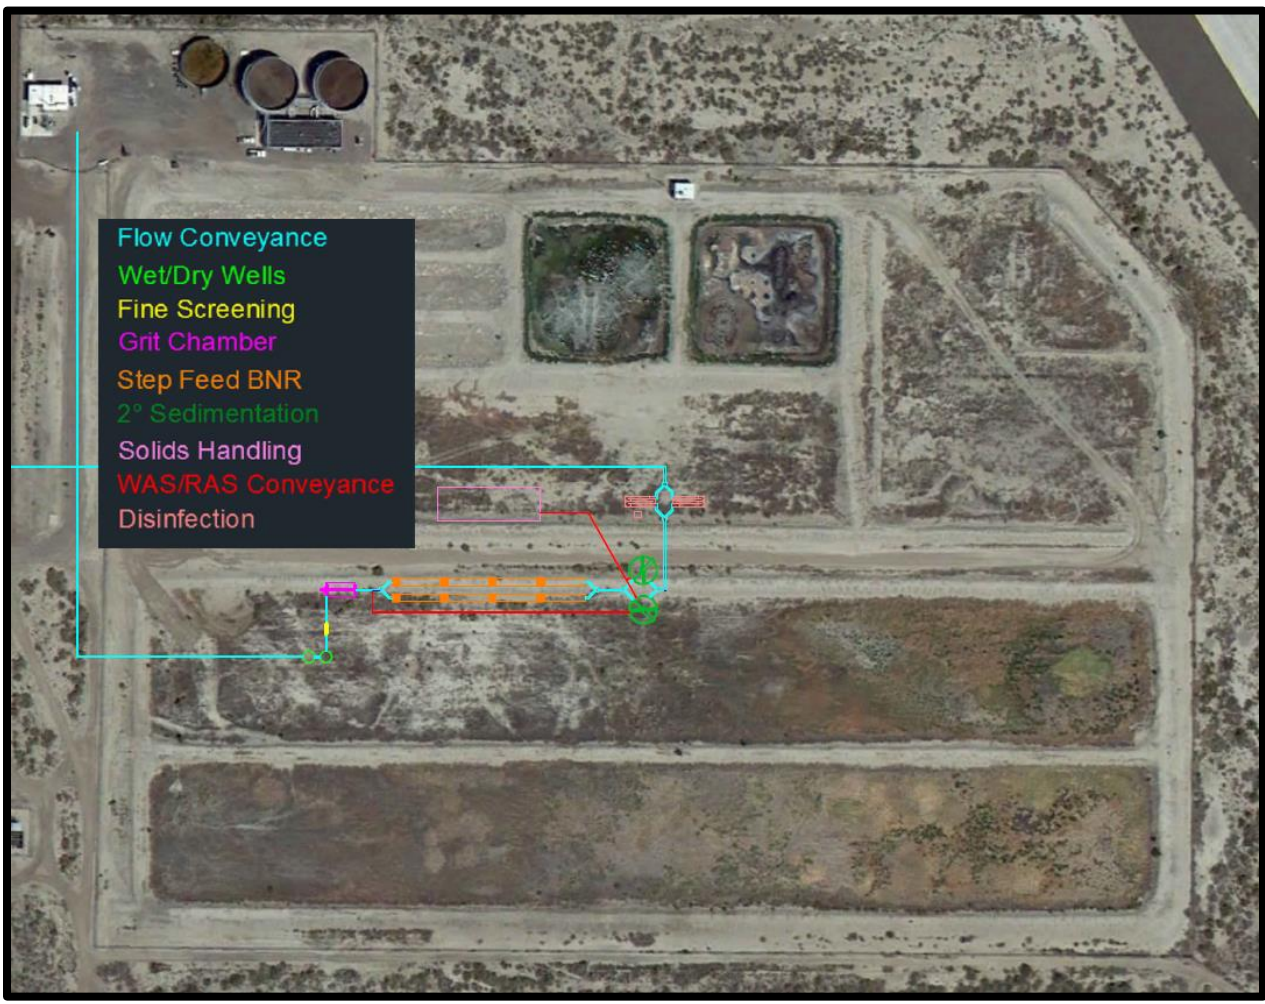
Overall plant schematic with existing NAS Fallon WWTP.
